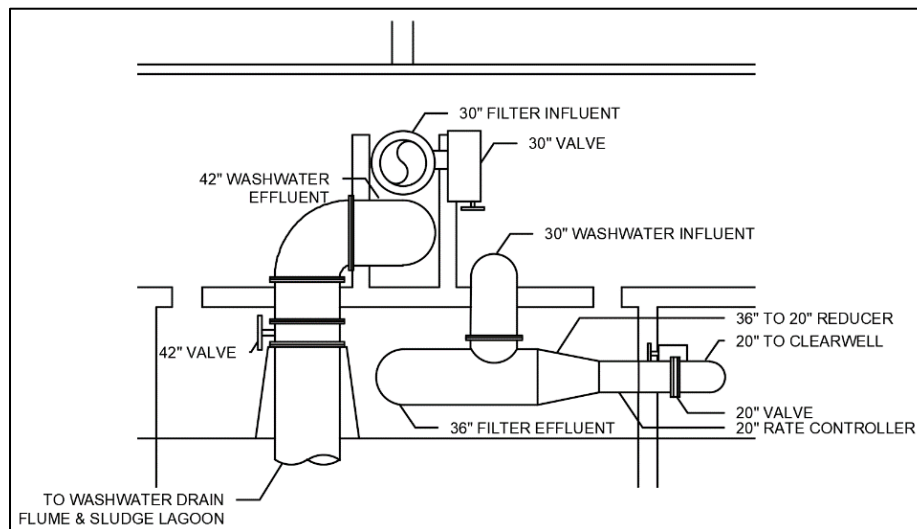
Existing Sand Filter Piping Forefront Consulting Drawing Set Page 19, Appendix 9.6, Reproduced From Black and Veatch (1973)
